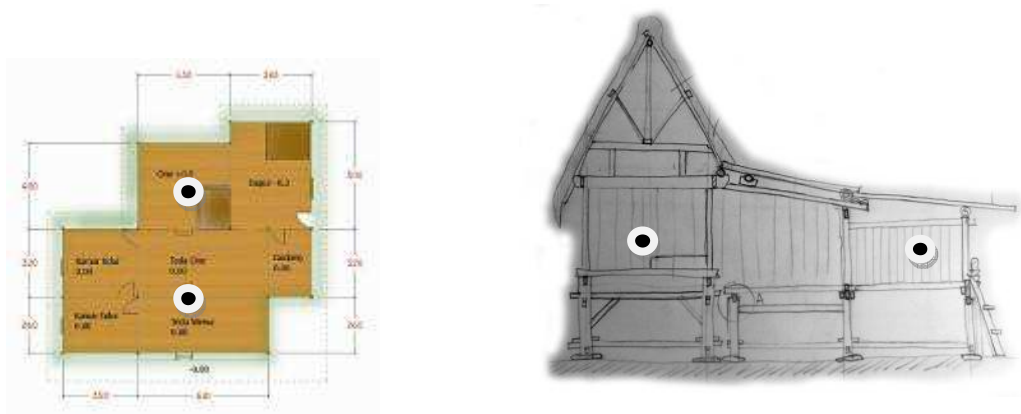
The positions of thermal data logger (○) a is plan and b is section
